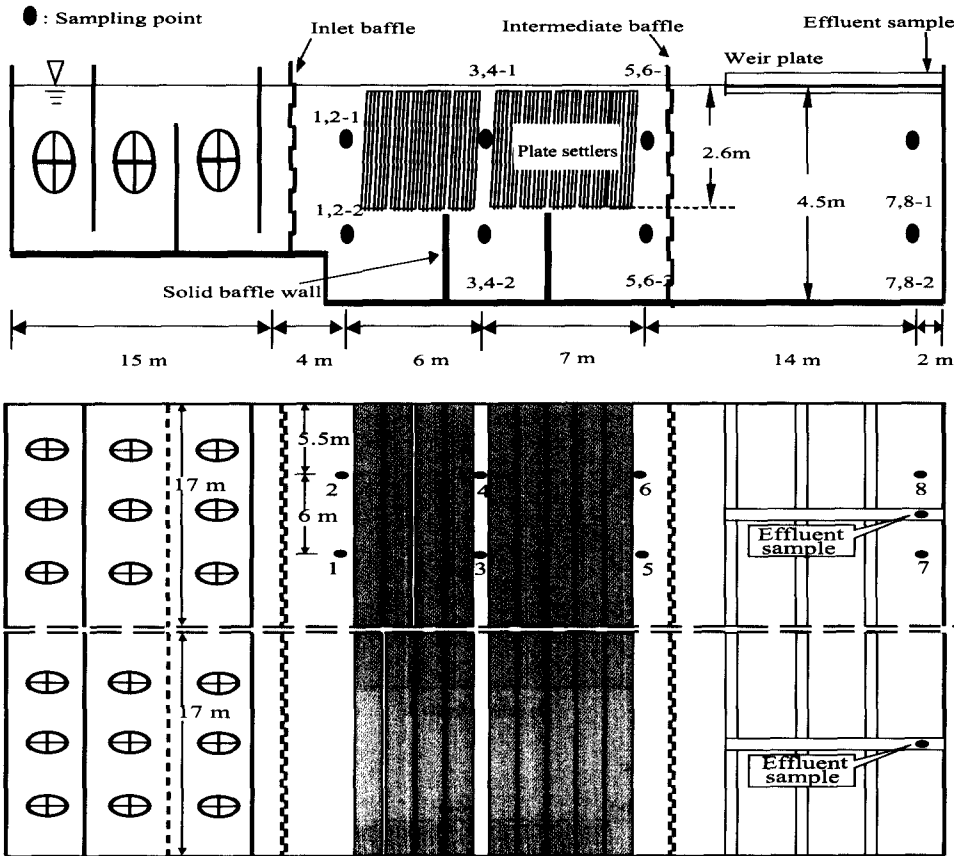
Elevation and plan of settling basin and sampling points (GE plant).
